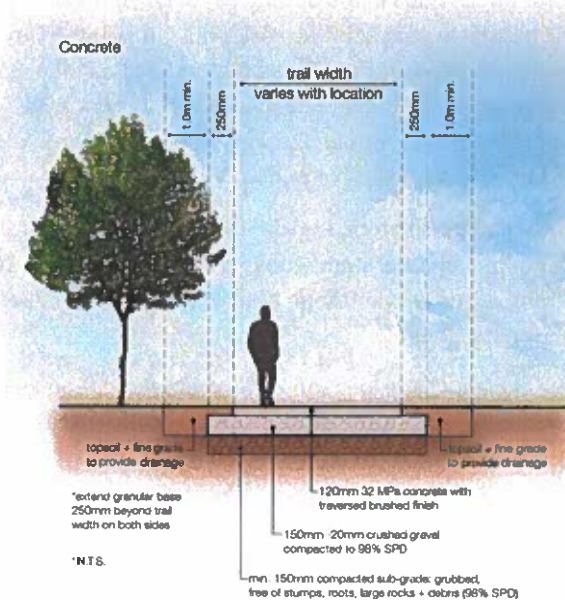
City of Lloydminster Standard Concrete Trail Cross-section
